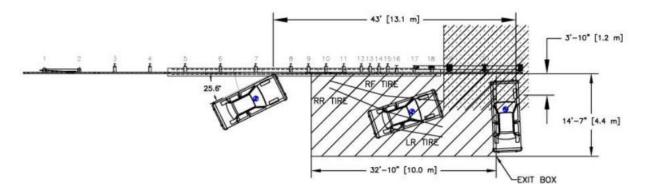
Test Impact Drawings for Test No. MWTC-2.
